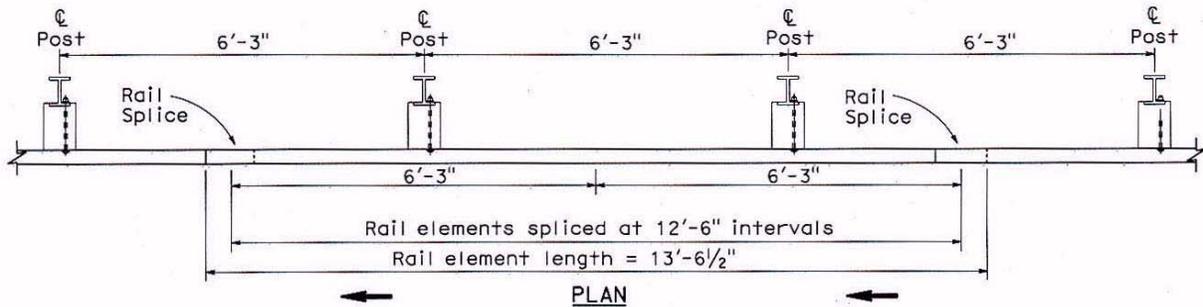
Modified Guardrail Installation with Type A Dike or 6 inch Curb
